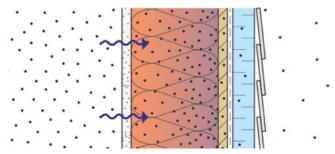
Vertical Section through Insulated 2x6 Wall with Vapour Impermeable Exterior Rigid Insulation
